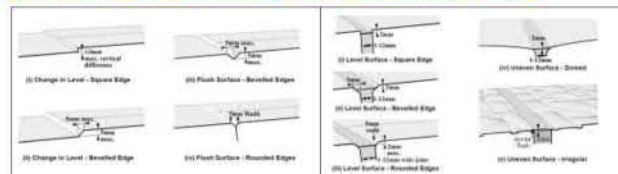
diagrams indicating the acceptable tolerances between pavement finishes
